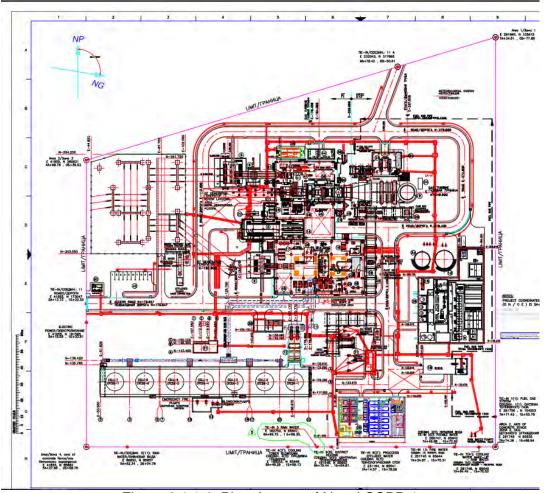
Plant Layout of Navoi CCPP-1
